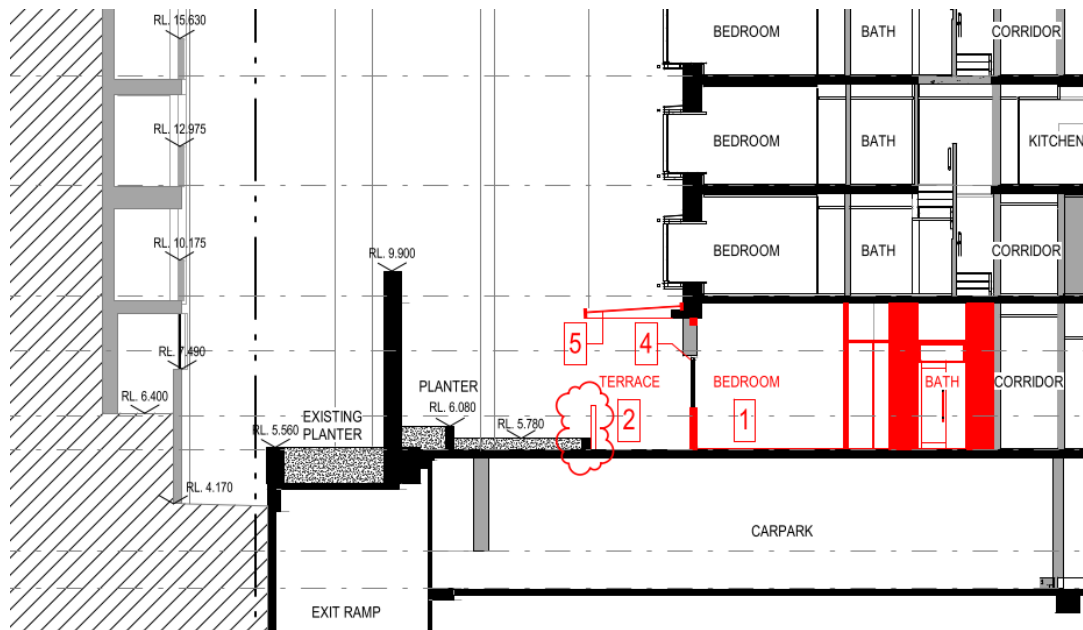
Section CC, demonstrating typical proposed terrace proximity and sight lines to neighbouring Marina One apartments
